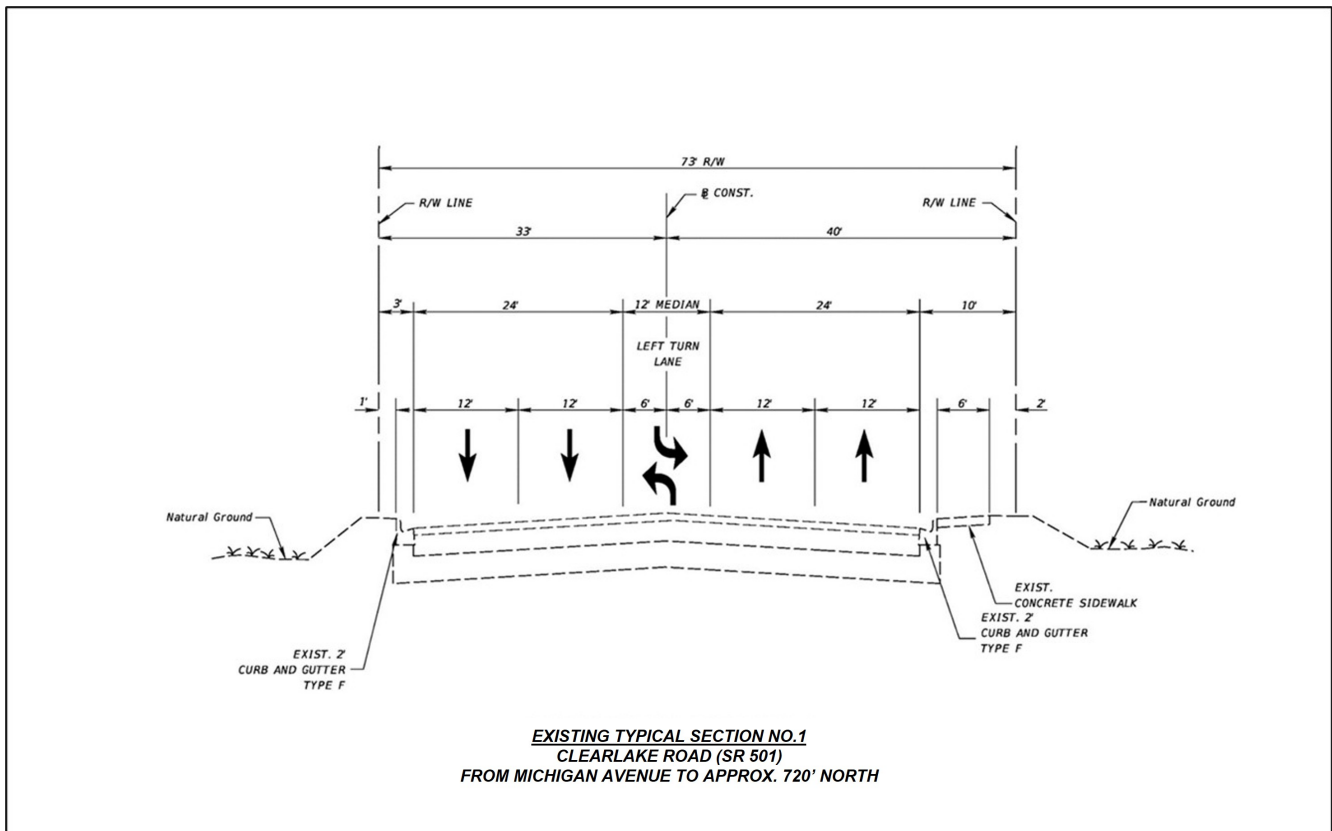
Existing Typical Section - From Michigan Avenue to Approximately 720 feet North
